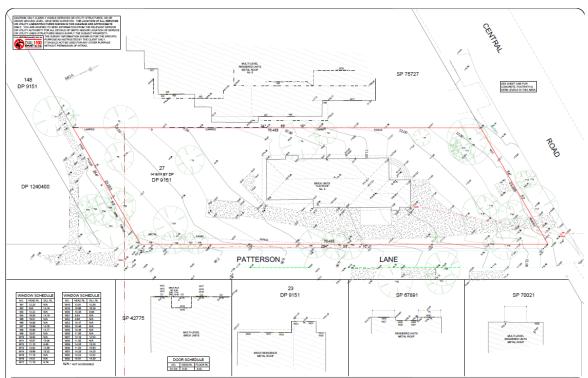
Outline of Adjoining Buildings, Road Reserves and Contours
